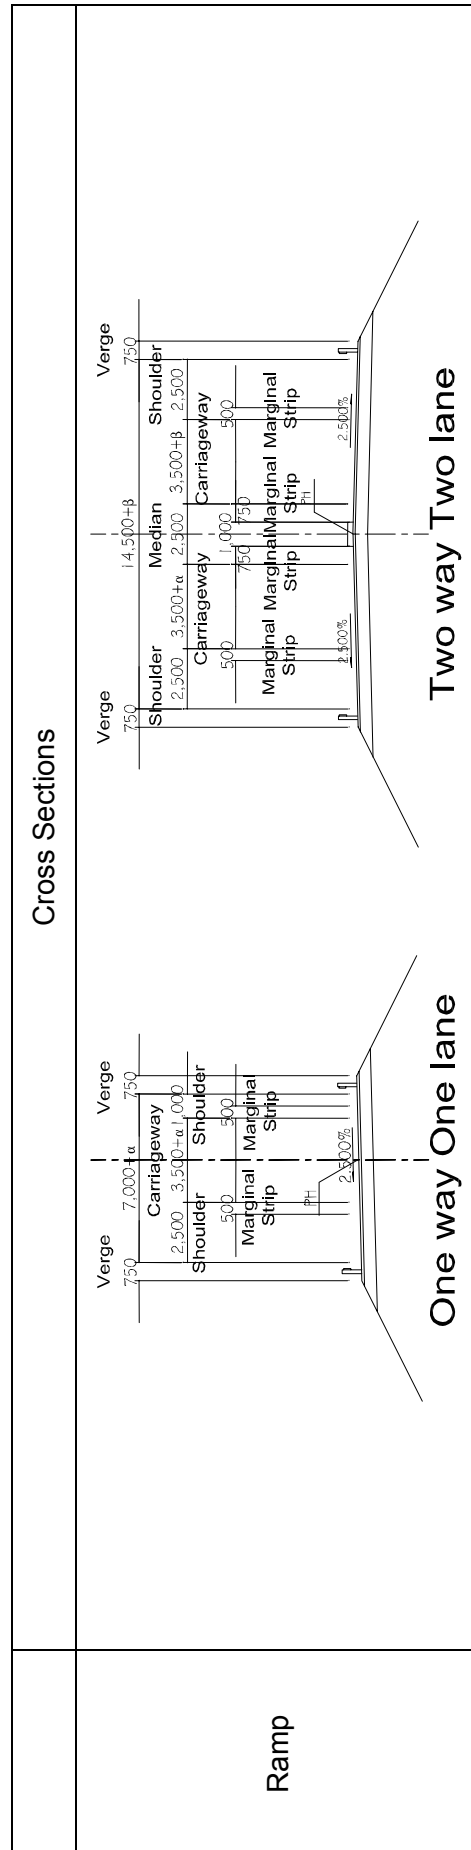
(1) Typical Cross Sections for Interchanges (1)
